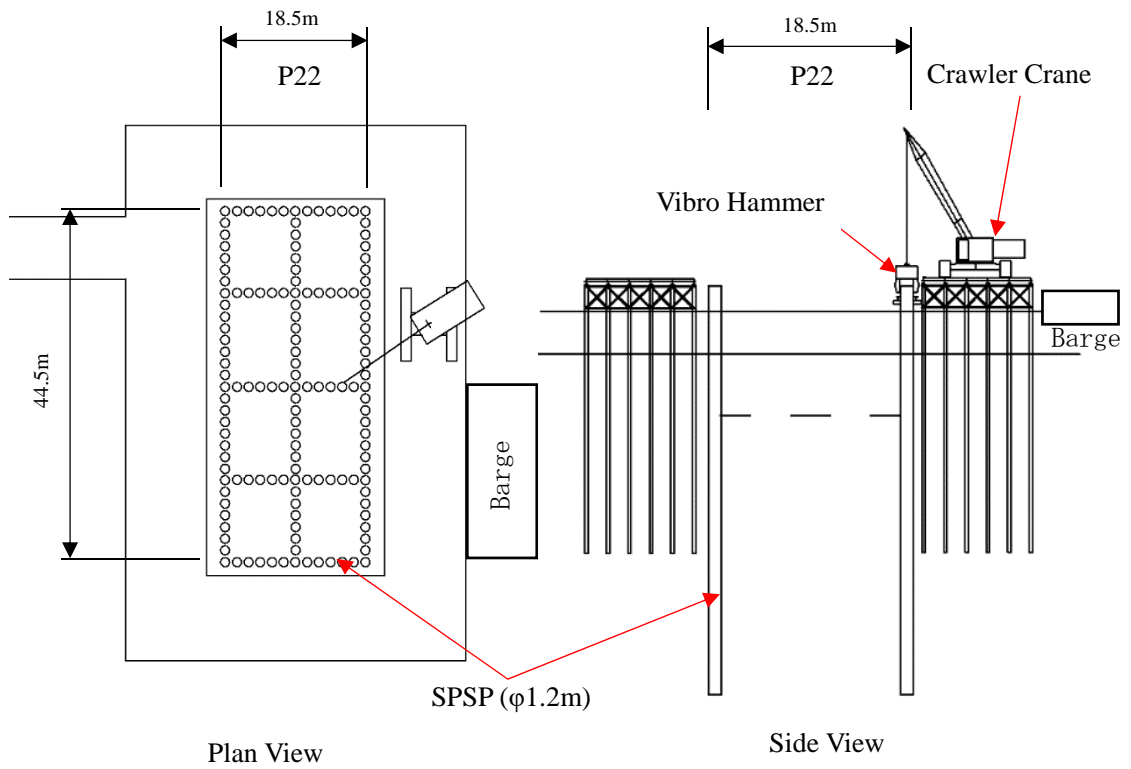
Reference Drawing for Steel Pipe Sheet Pile Foundation Construction at P22
